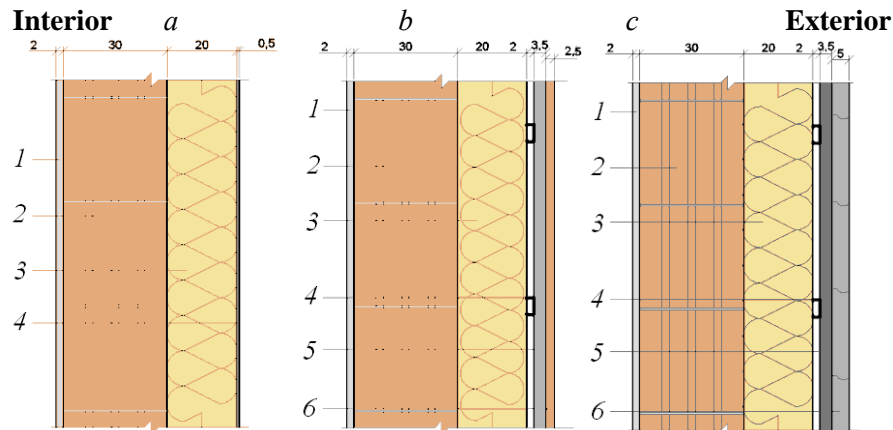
Exterior wall of brickwork: *a* – outer wall with outer finished with reinforced mineral plaster; *b* – outer wall of brickwork finished with wood panel; *c* – outer wall with exterior finish of natural stone
